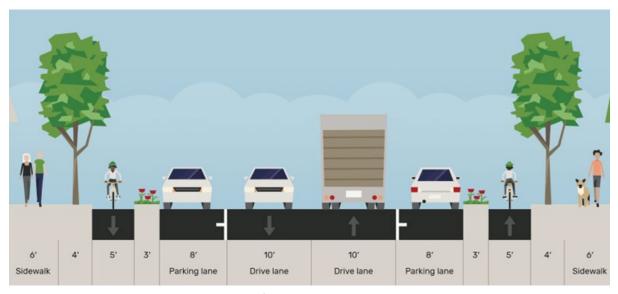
Typical street standard option for new essential streets. Some of the first new developments could make use of public funding to meet street requirements.
